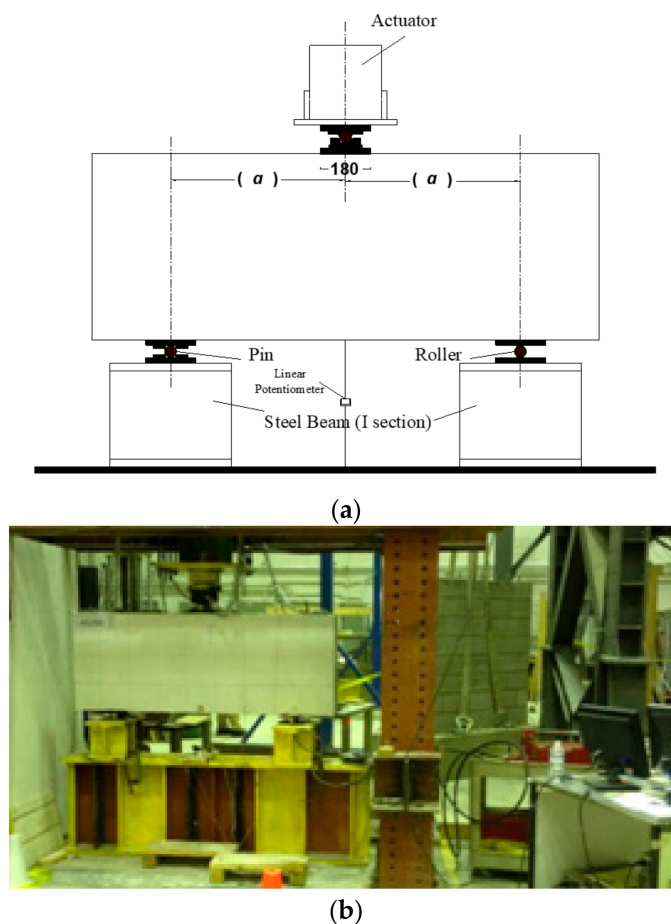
Typical test setup for beams: (a) schematic elevation view, (b) photo.
